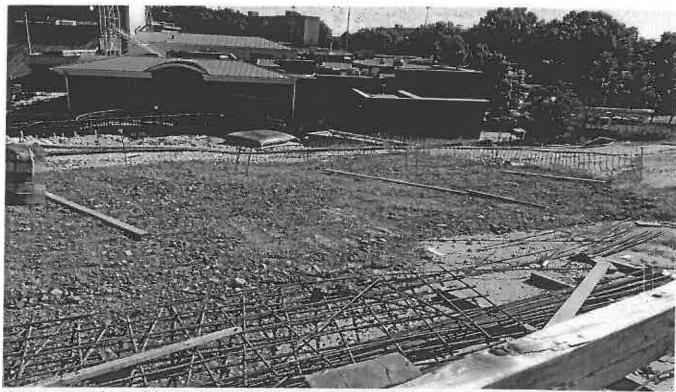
Exposed area of the site adjacent the Tunnel project N side, with a view of the Gossette Building
